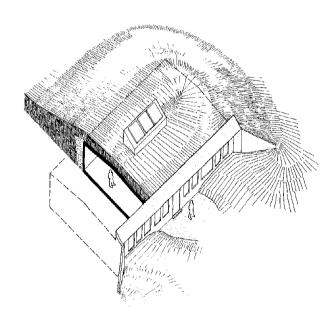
Type D-1 Single Window-Wall Dwelling
